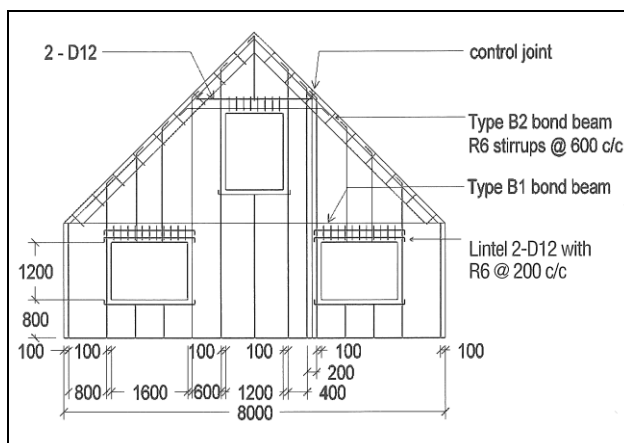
Bond Beam and Lintel Reinforcement for West Wall (Bracing Line B)
